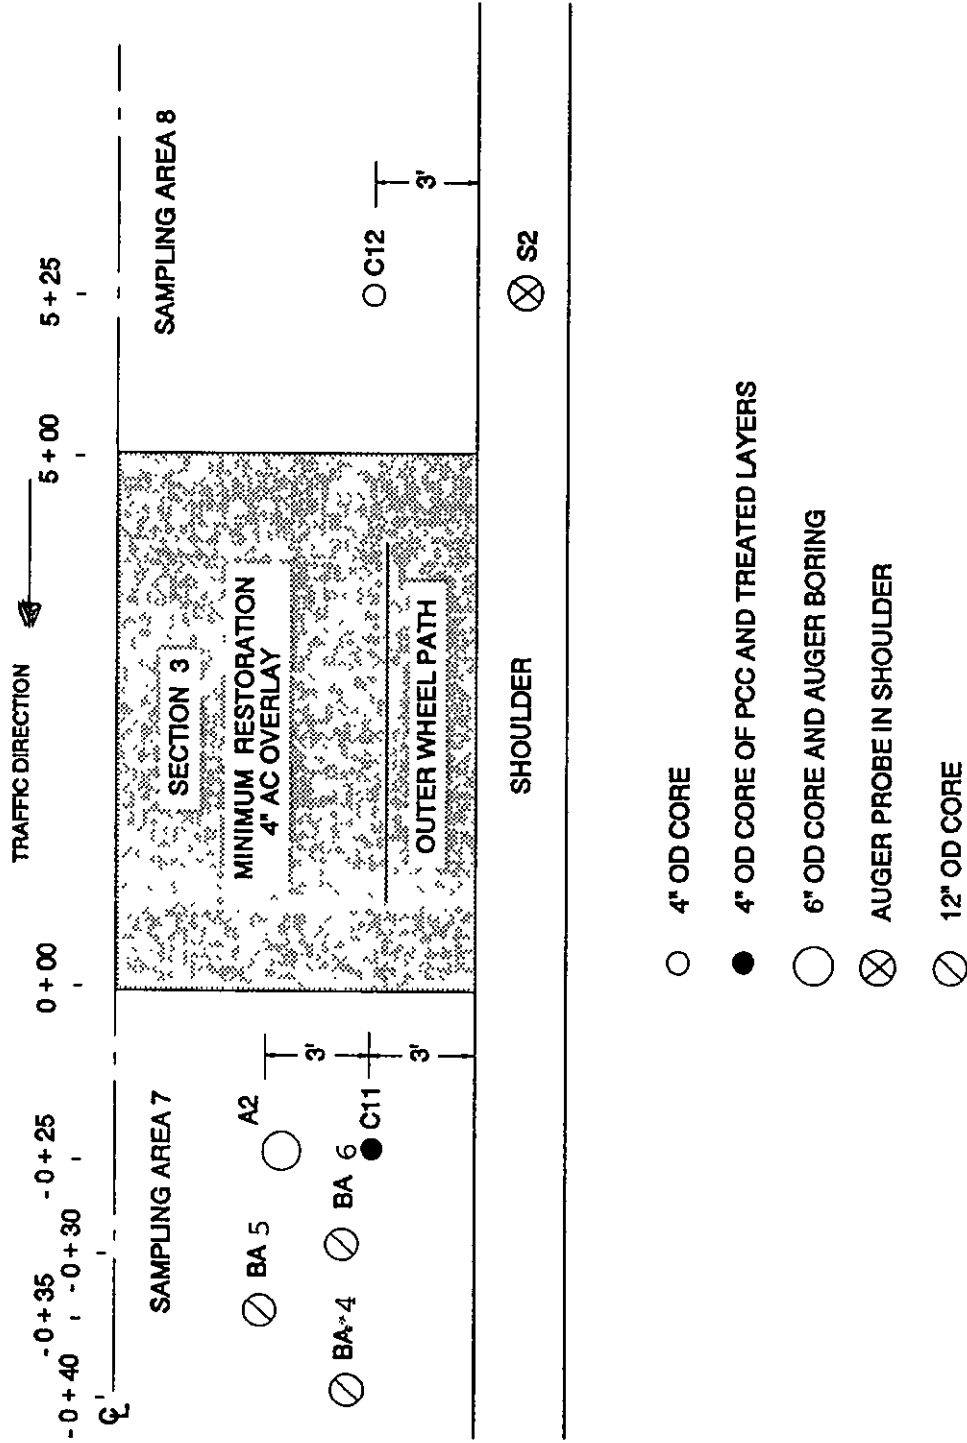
Example of "Pre-Construction" Sampling Plan for Test Section 3
